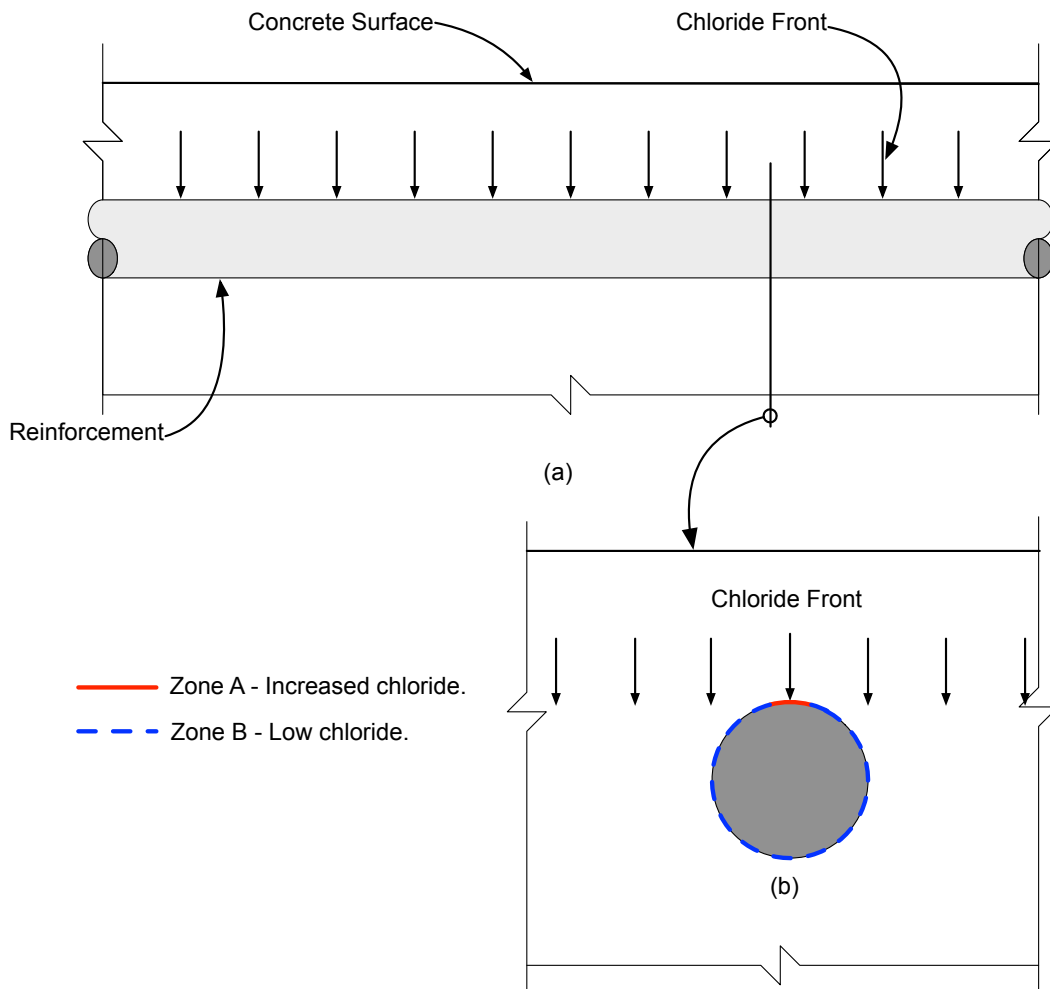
Rebar depassivation with variable chloride front. (a) Elevation of idealized reinforcing steel embedded in concrete. (b) Section through reinforcing steel bar showing chloride contacting the bar.
